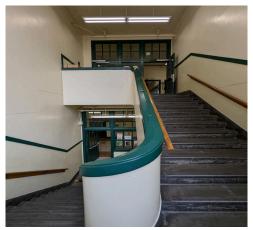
Typical stair tower, with original, discontinuous wood railings
